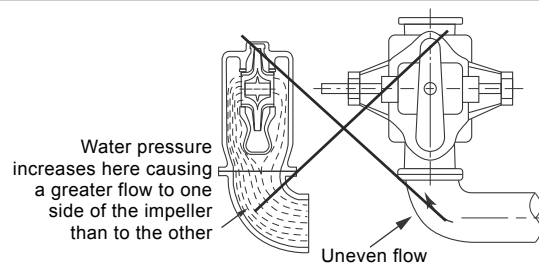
Unbalanced loading of a double-suction impeller due to uneven flow through a horizontal elbow close to the pump
